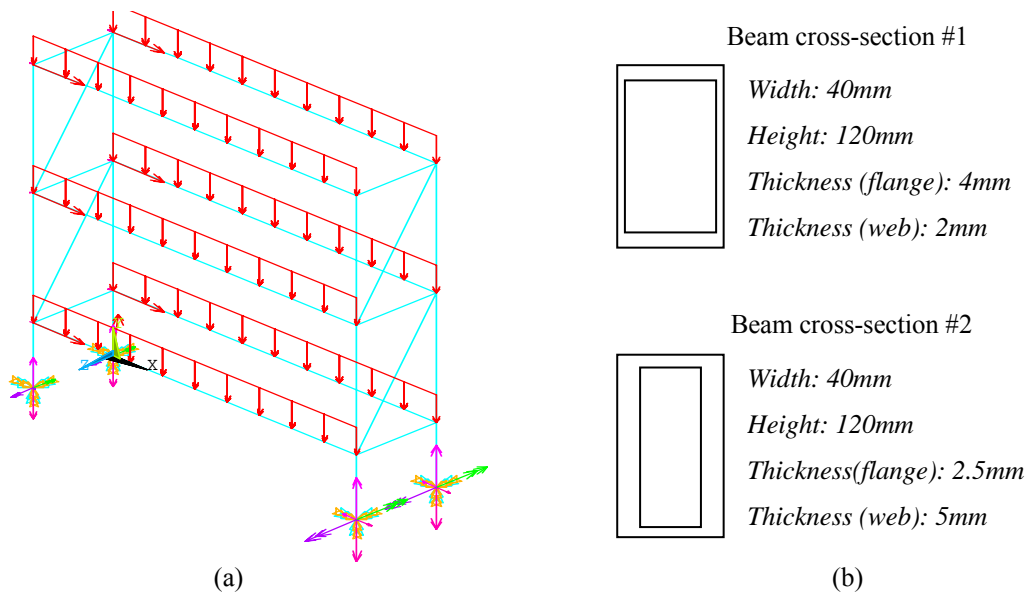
Frame examined (a) developed model and (b) beam cross-sections used
